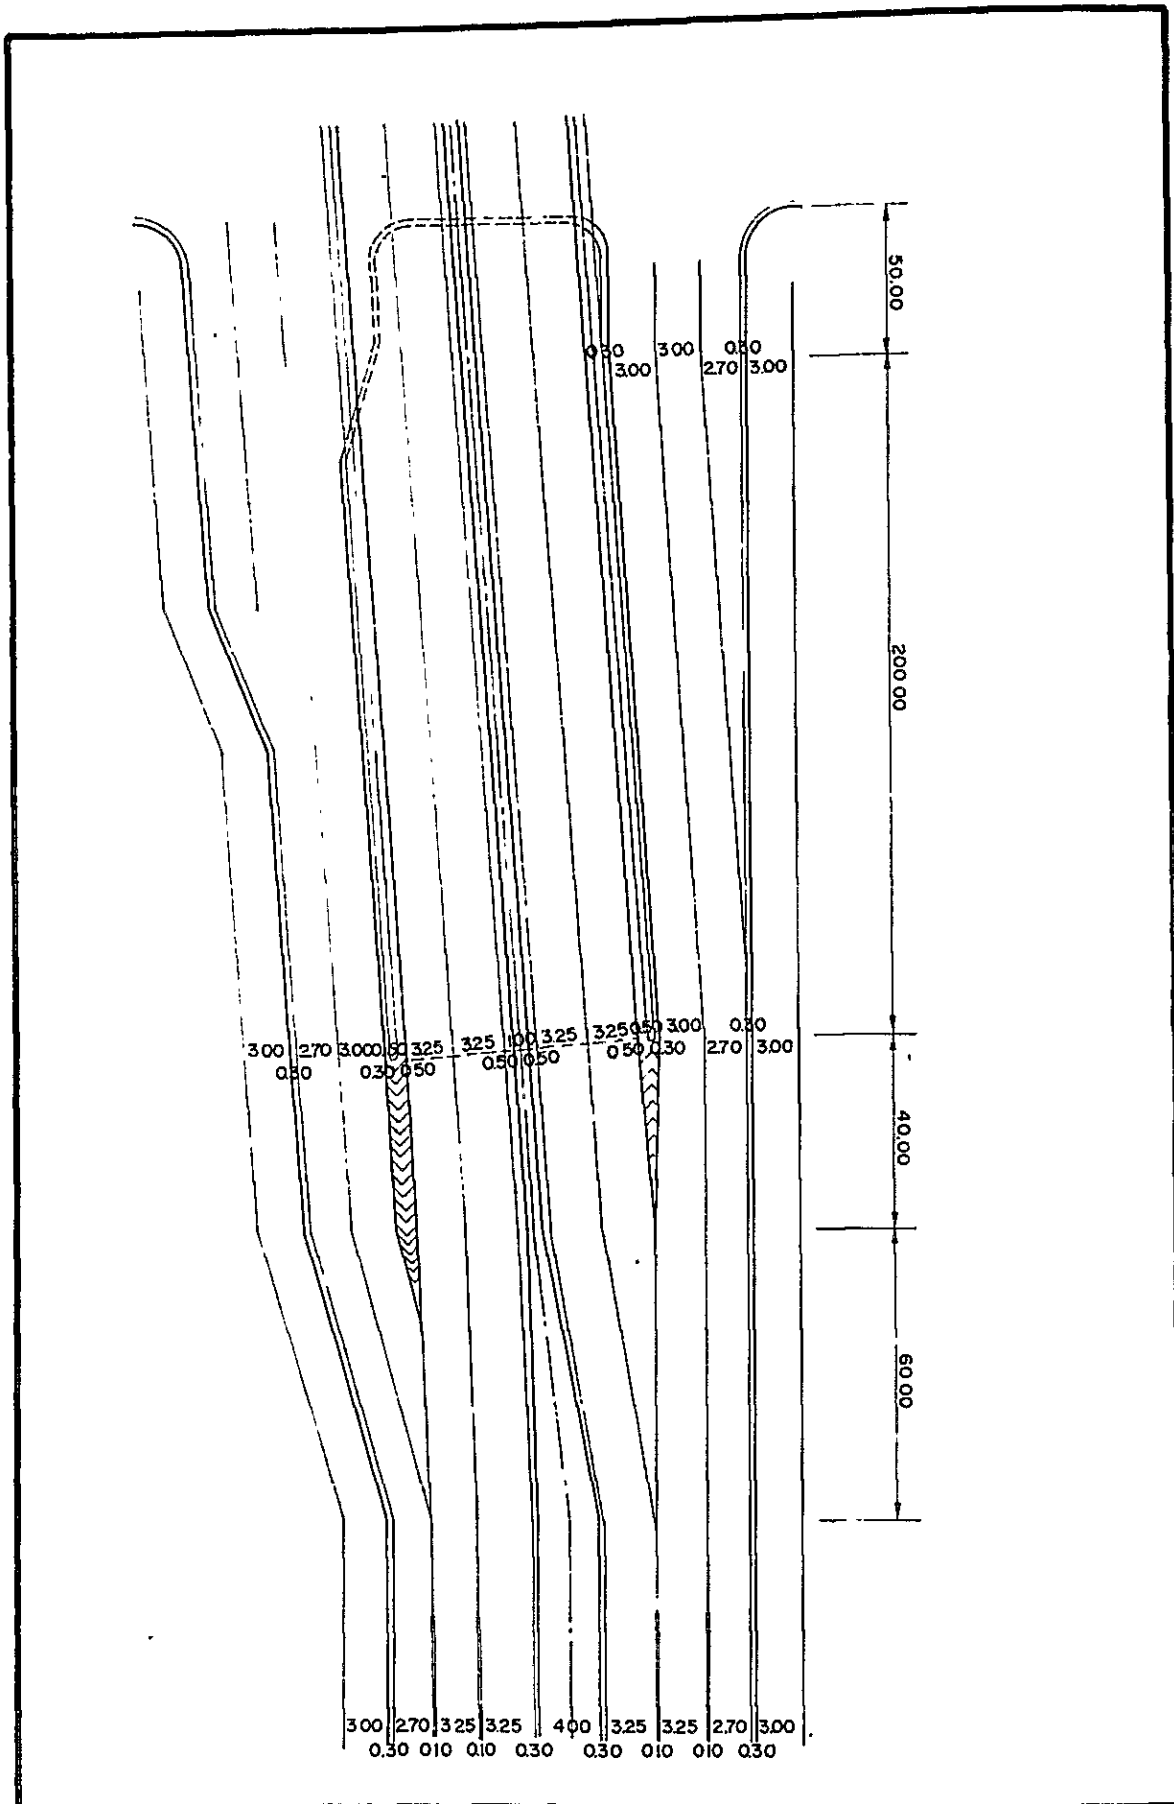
ROADWAY PLAN (BANGKOK SIDE)
